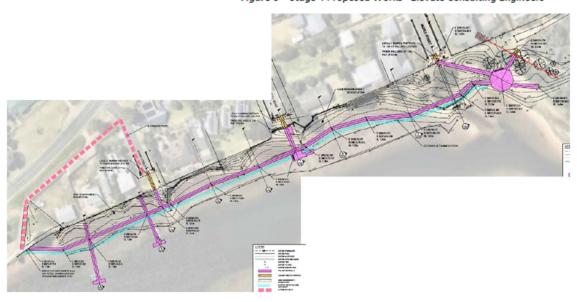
Stage 4 Site Plan– Elevate Consulting Engineers
